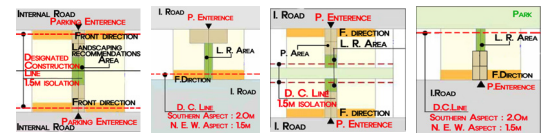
The restriction types of construction line, park entrance and landscape space by District Unit Plan
